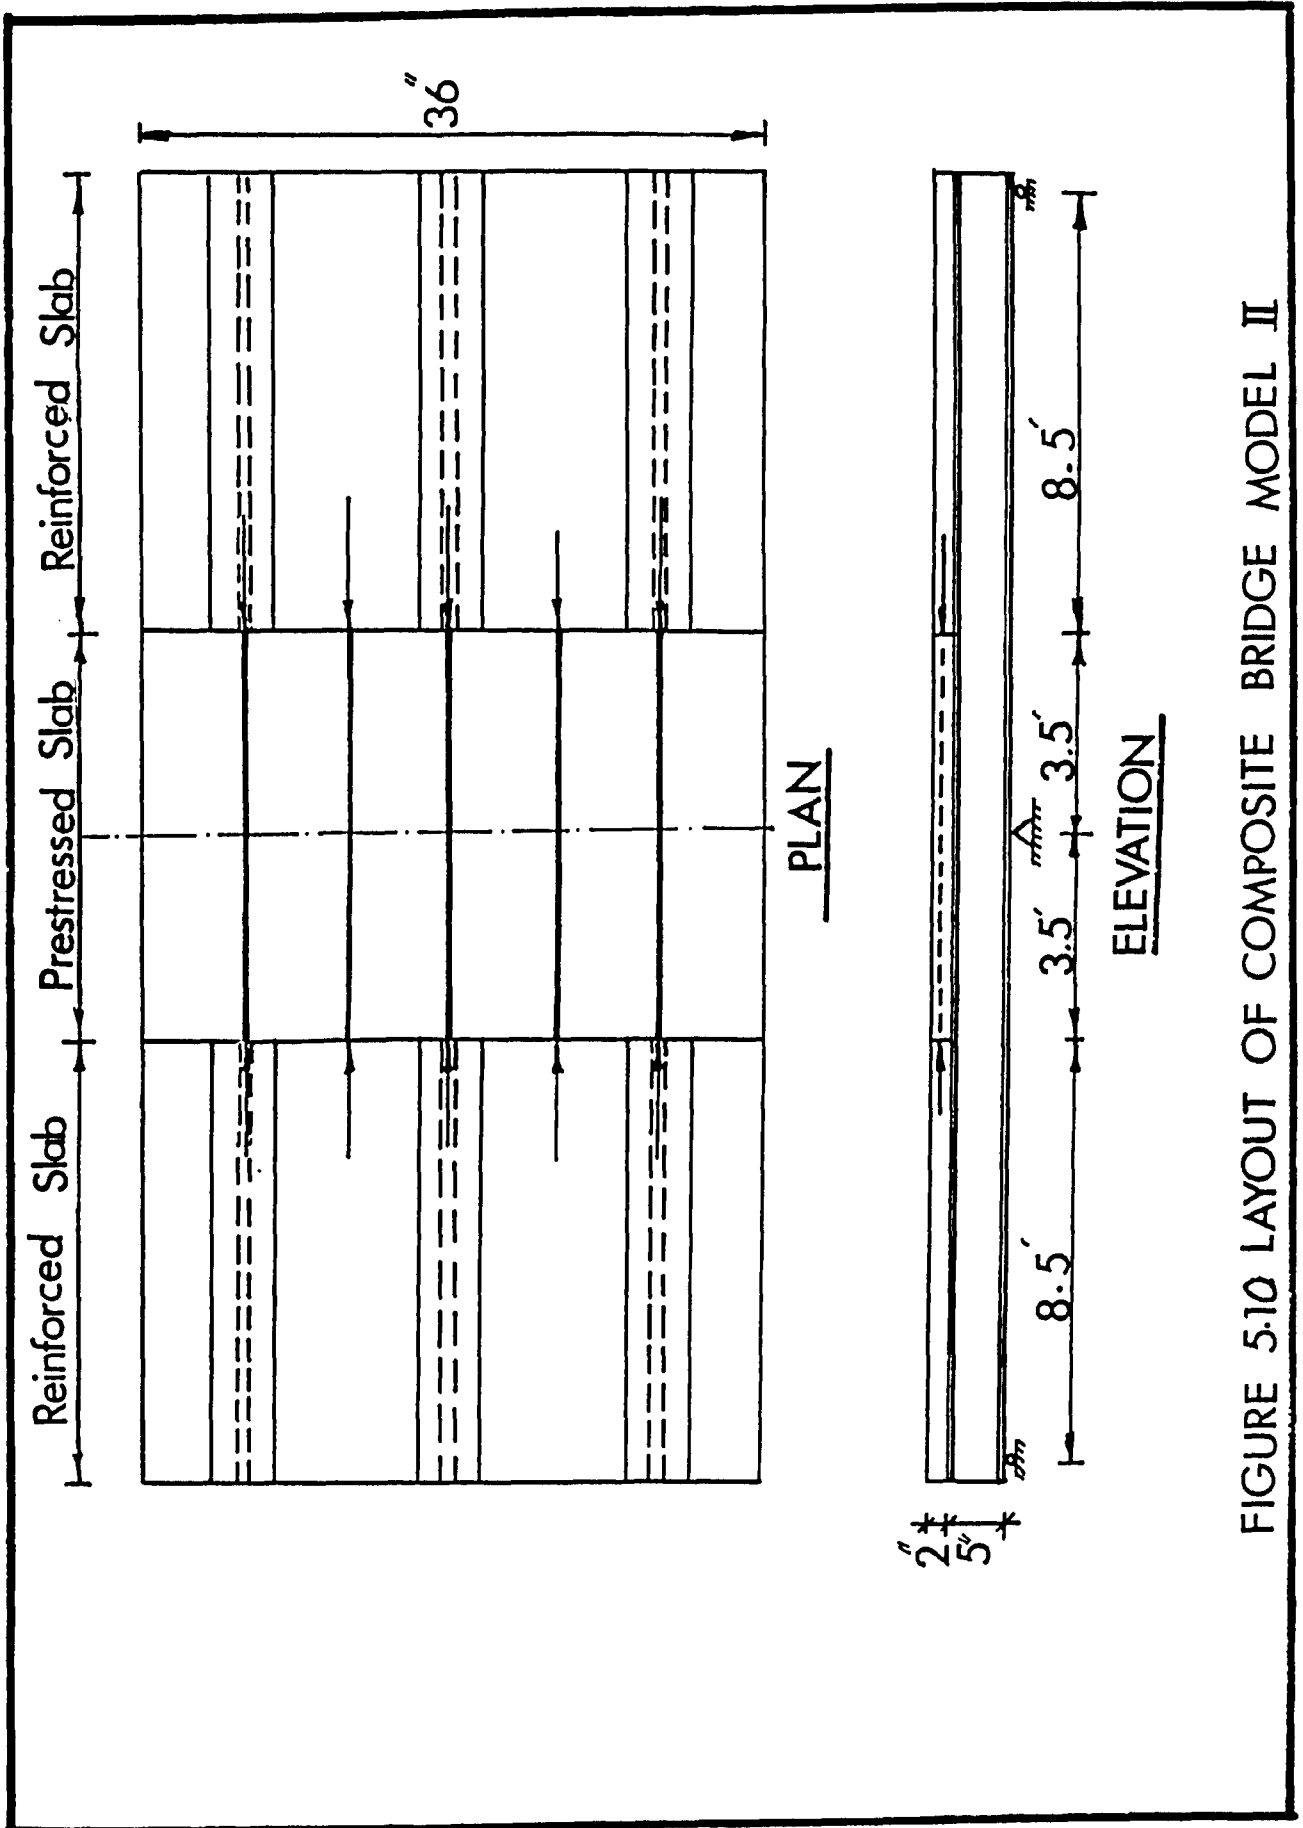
LAYOUT OF COMPOSITE BRIDGE MODEL II
